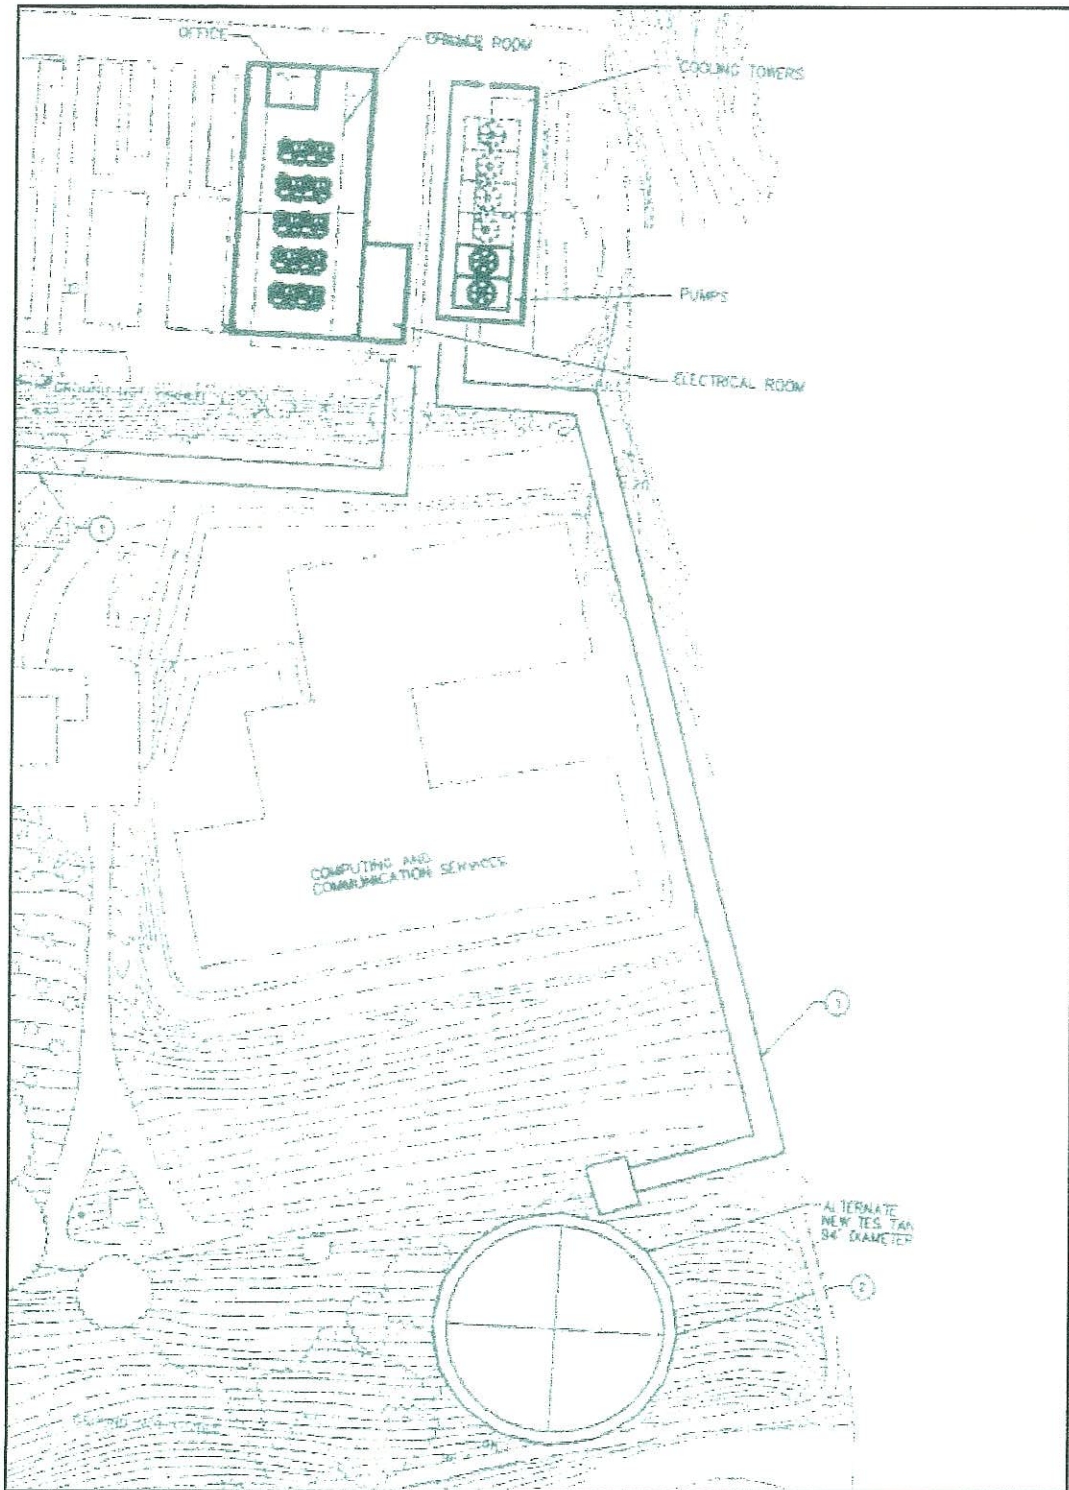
Plan for Tank and Chiller Plant with Associated Pipeline Alignment.
